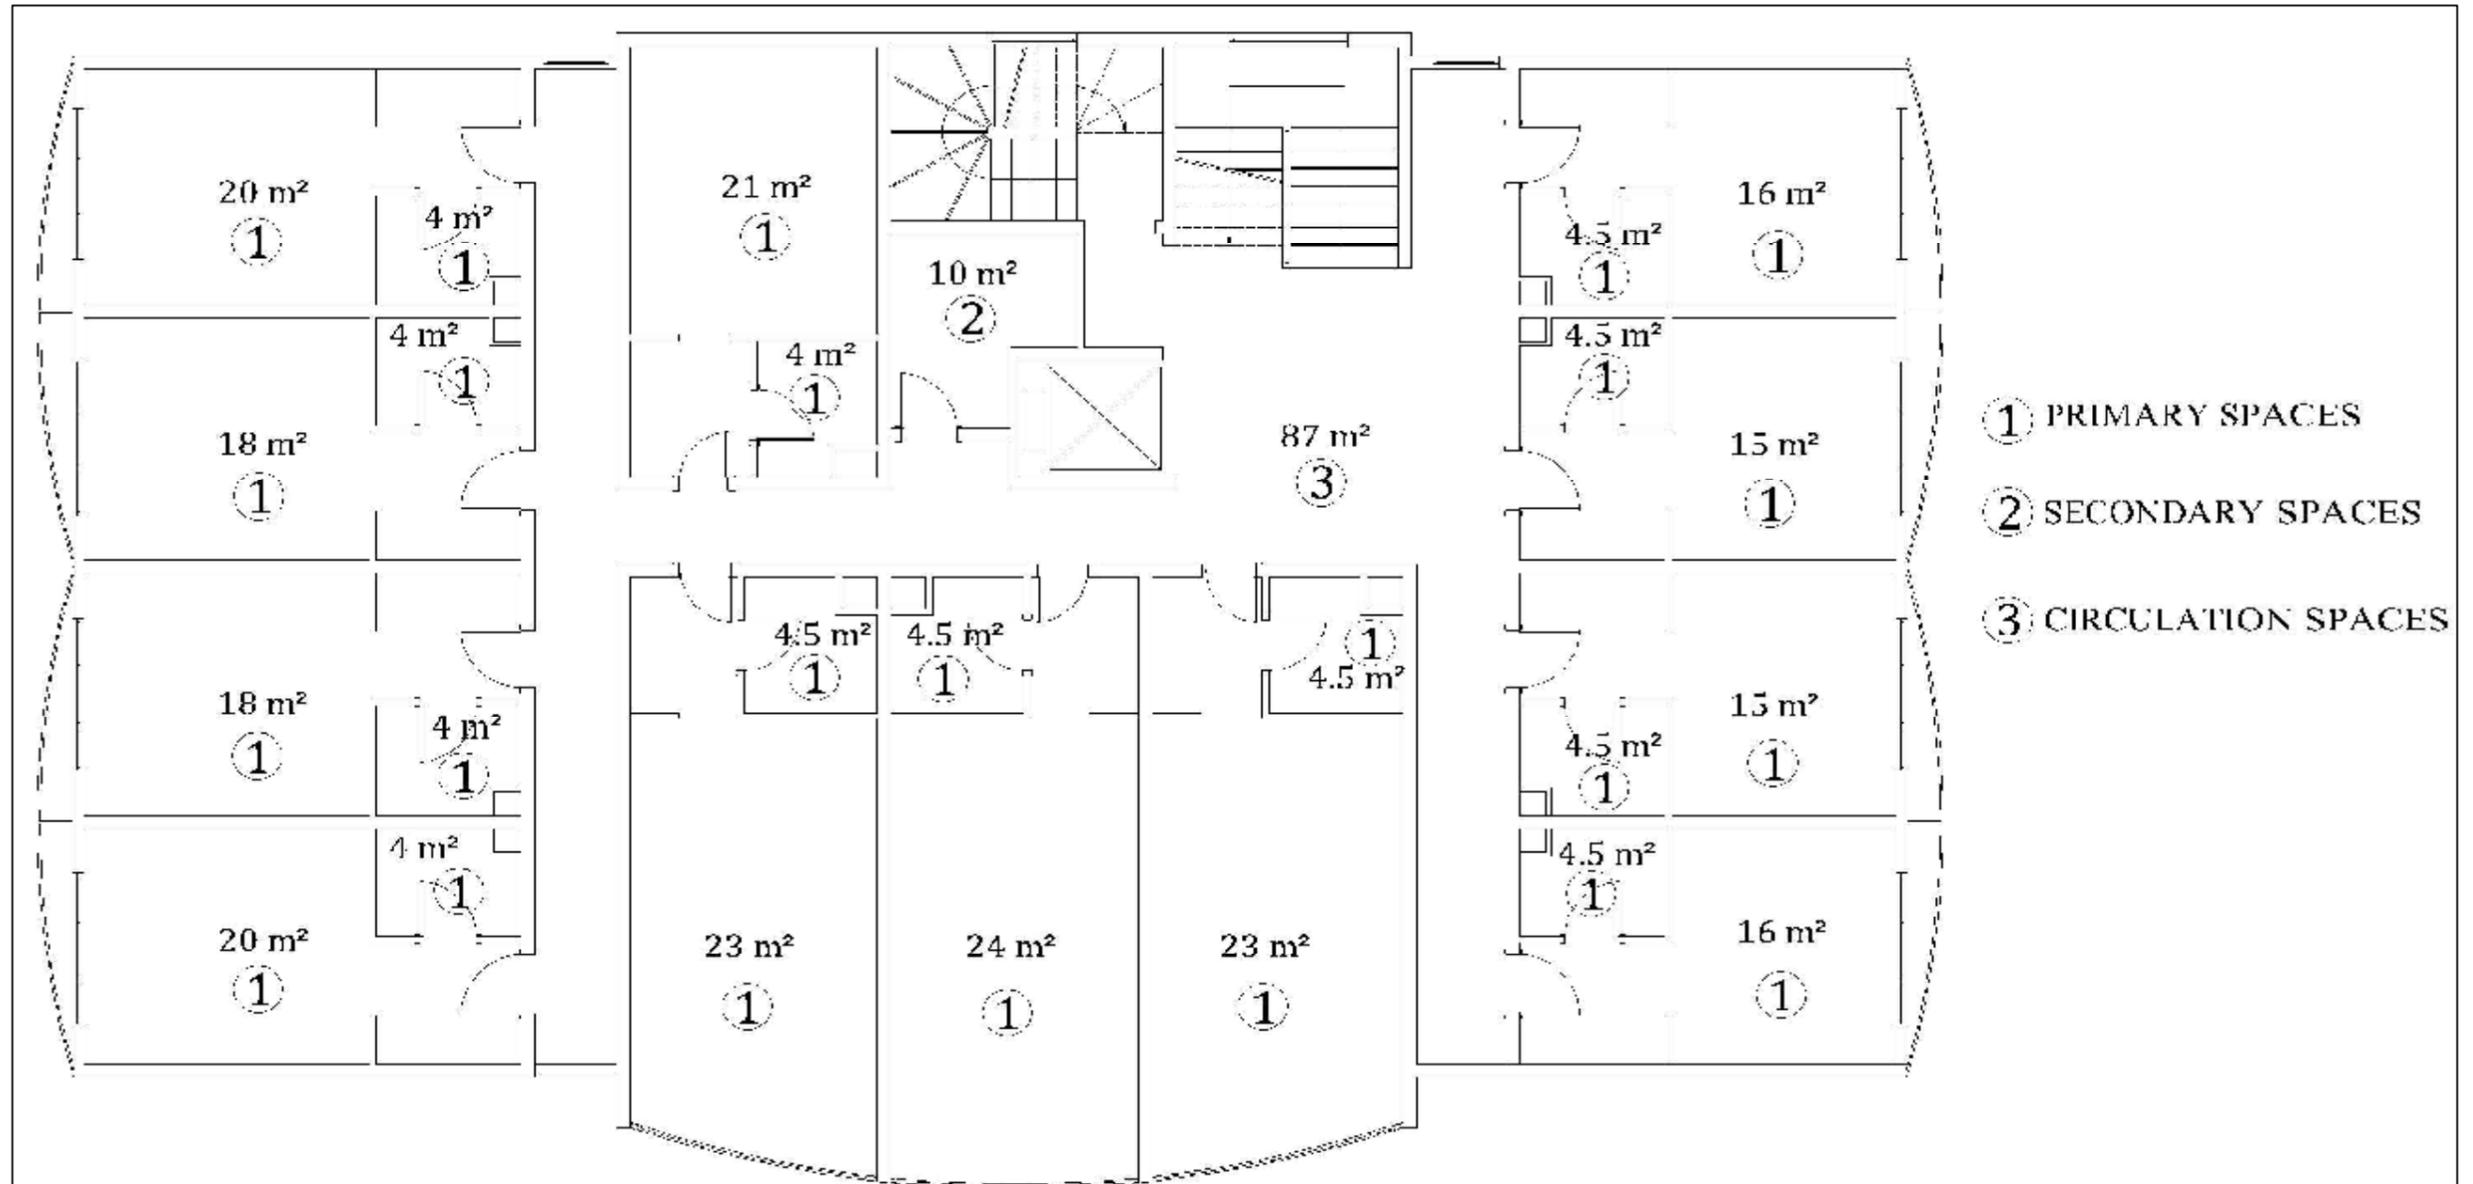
Floor plan of Sample 08 (S08) displaying, primary, secondary and circulation spaces.
